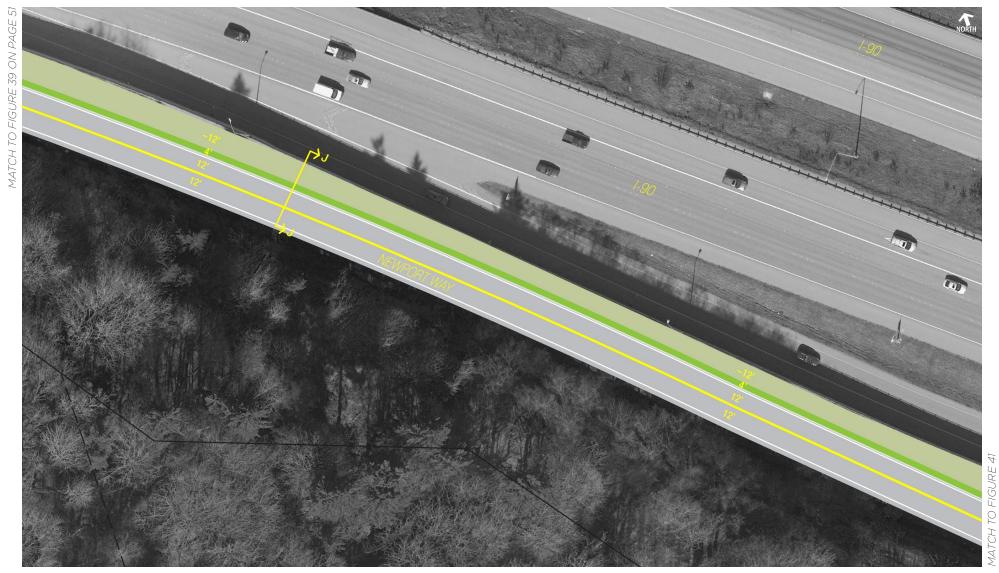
Trail between the existing pedestrian bridge over I-90 at SE Newport Way and Lakemont Blvd SE.
